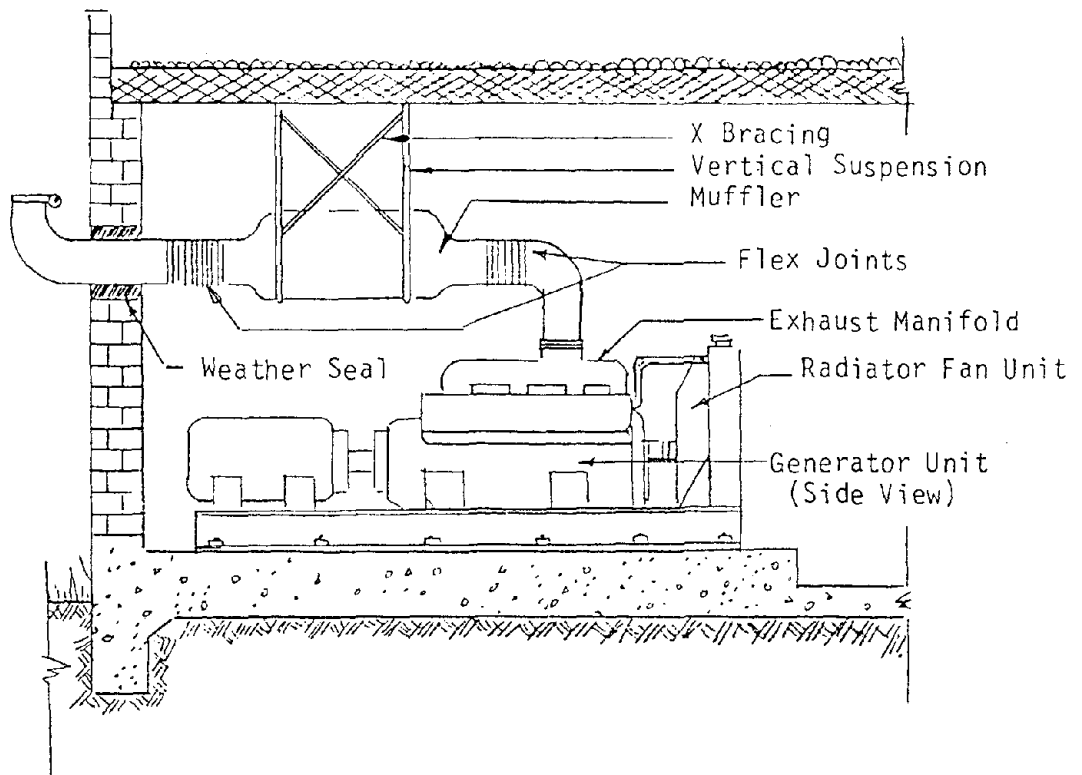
Typical Flexible Muffler Exhaust System Installation (71)
